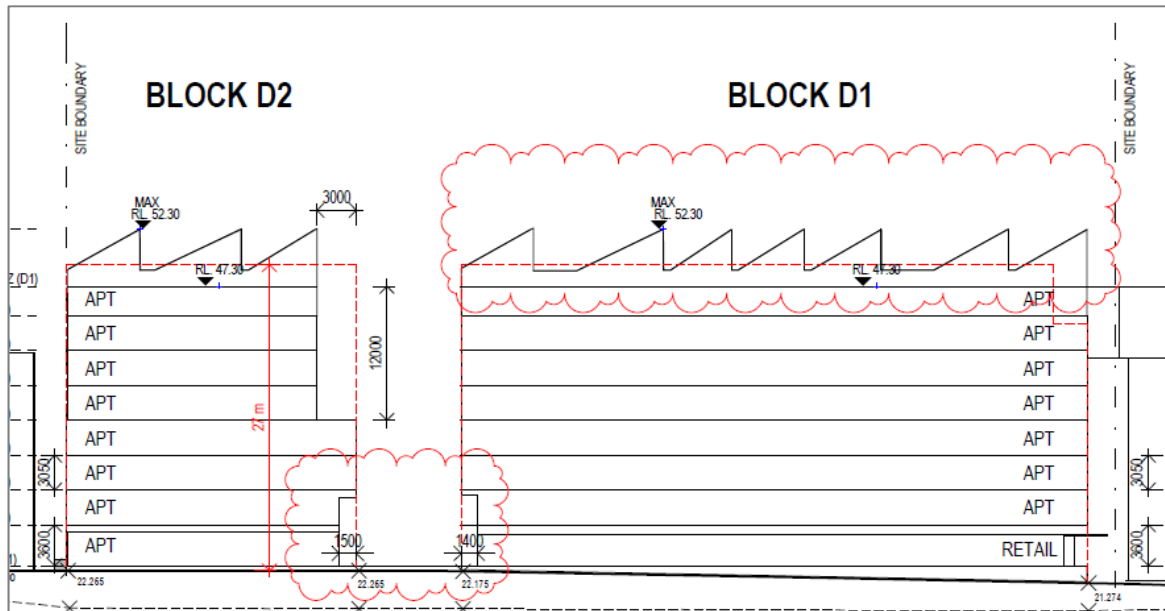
Building D - Building Volume comparison - approved Stage 1 envelope shown in red dashed line
